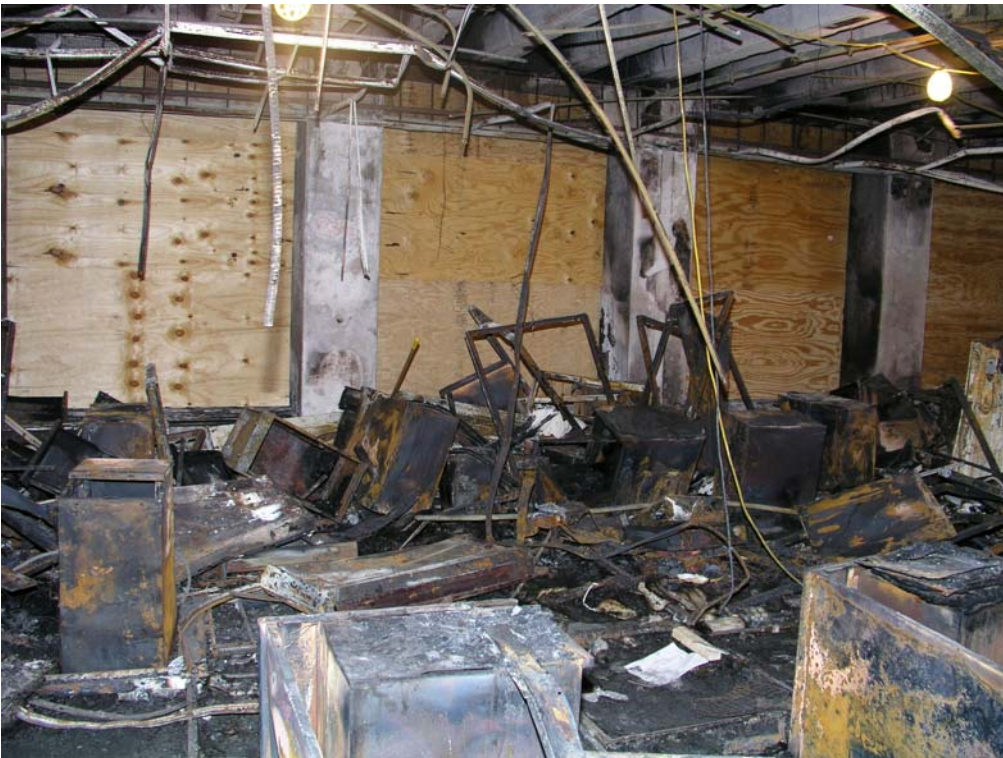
Looking toward the southeast portion of the open office area of Suite 1240
